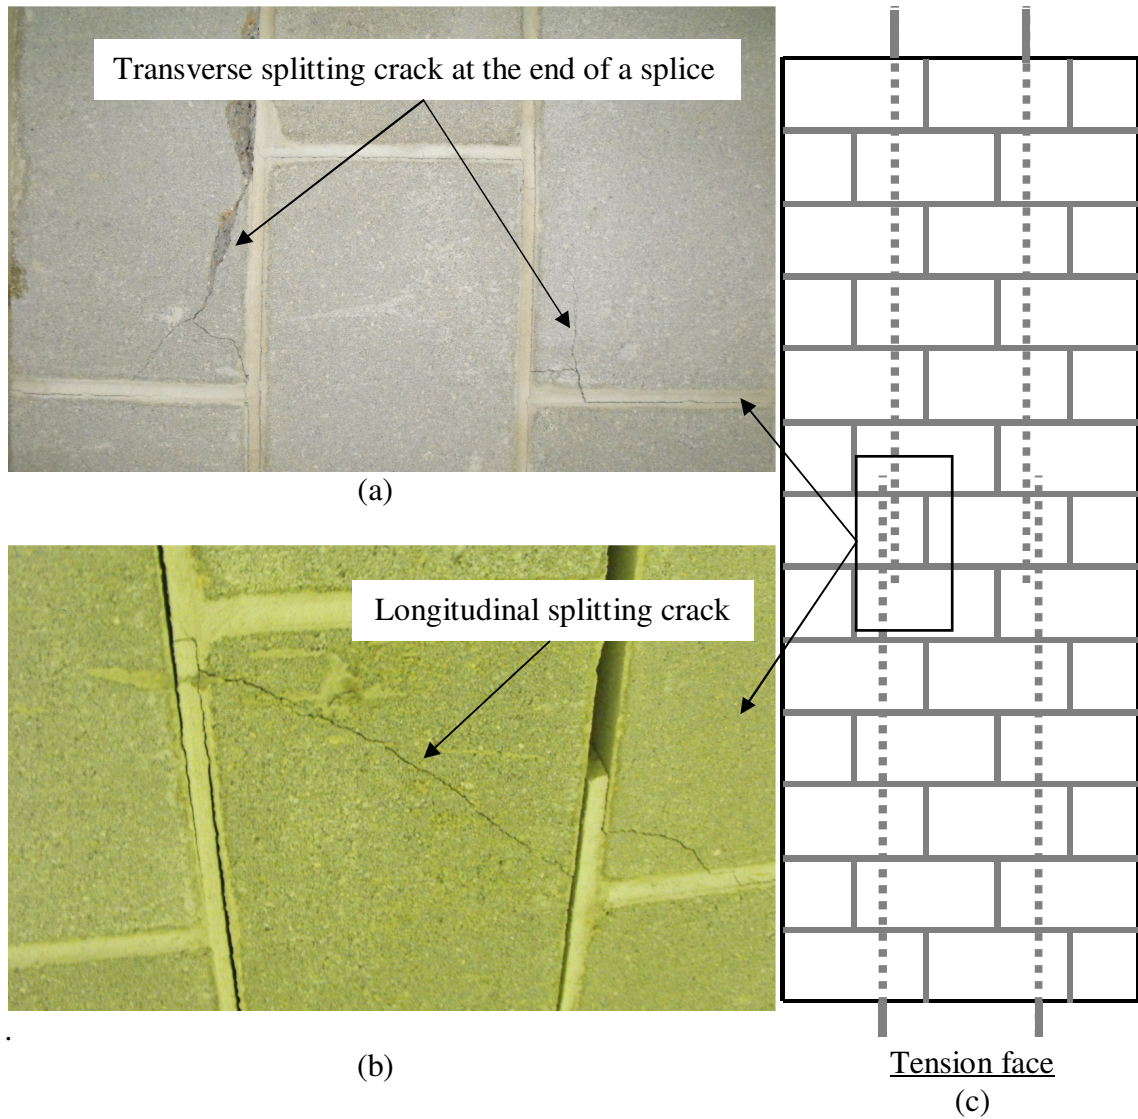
Cracking at failure for wall splice specimen with contact lap splices: (a) transverse splitting crack, (b) longitudinal splitting crack, and (c) crack locations.
